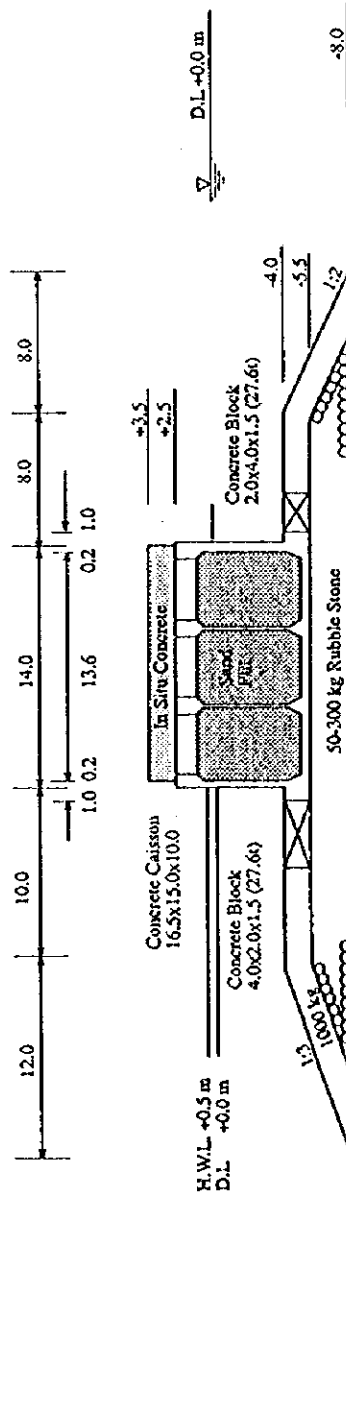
Standard Cross Section of Breakwater Caisson Type (-8.0m)
